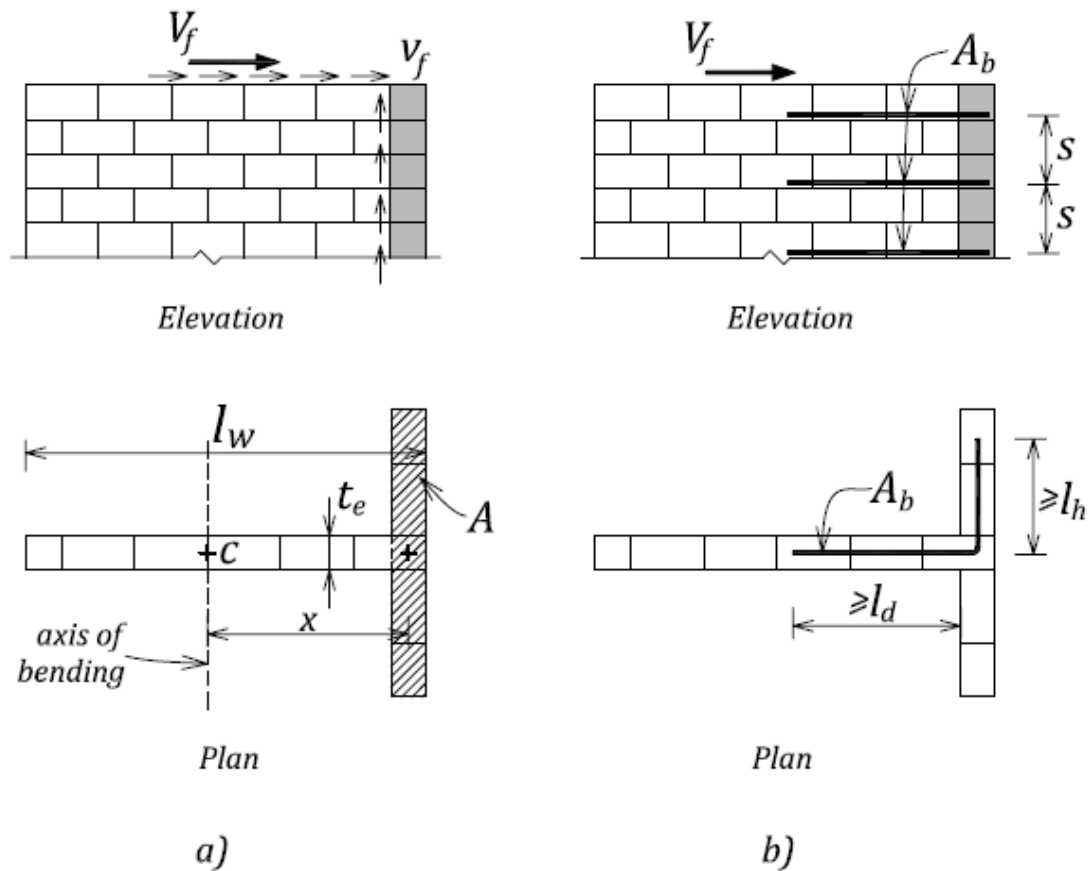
Shear resistance of the web-to-flange interface: a) bonded masonry intersection; b) horizontal reinforcement at the intersection.
